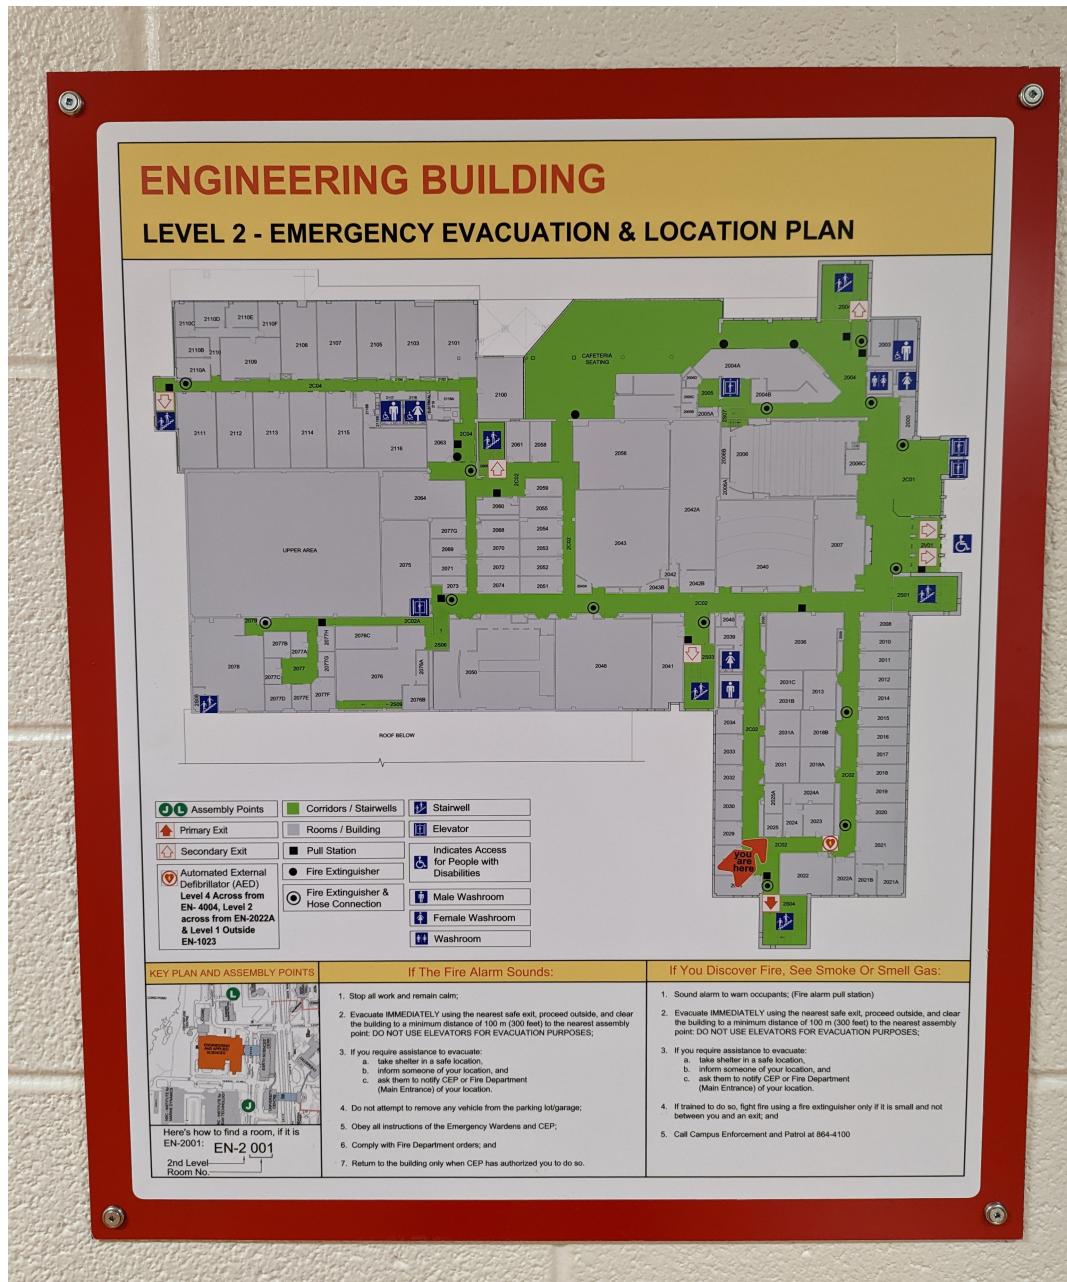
S.J. Carew Engineering And Applied Science (EN) Building – Level 2 Floor Plan
